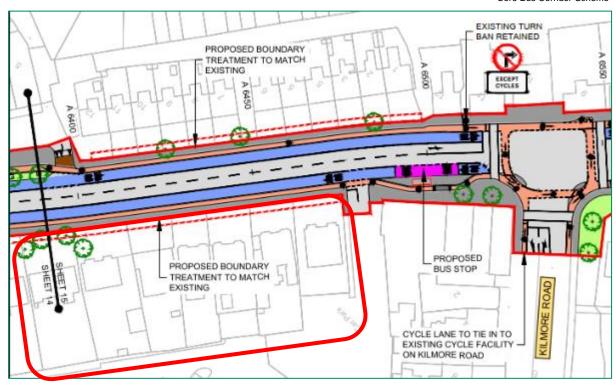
Proposed new Layout at Southern section of Mornington Park, Malahide Road
